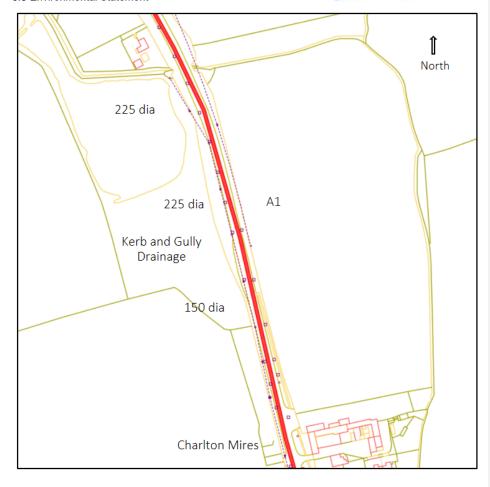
West Linkhall Road Proposal to use A1 Drainage Network
